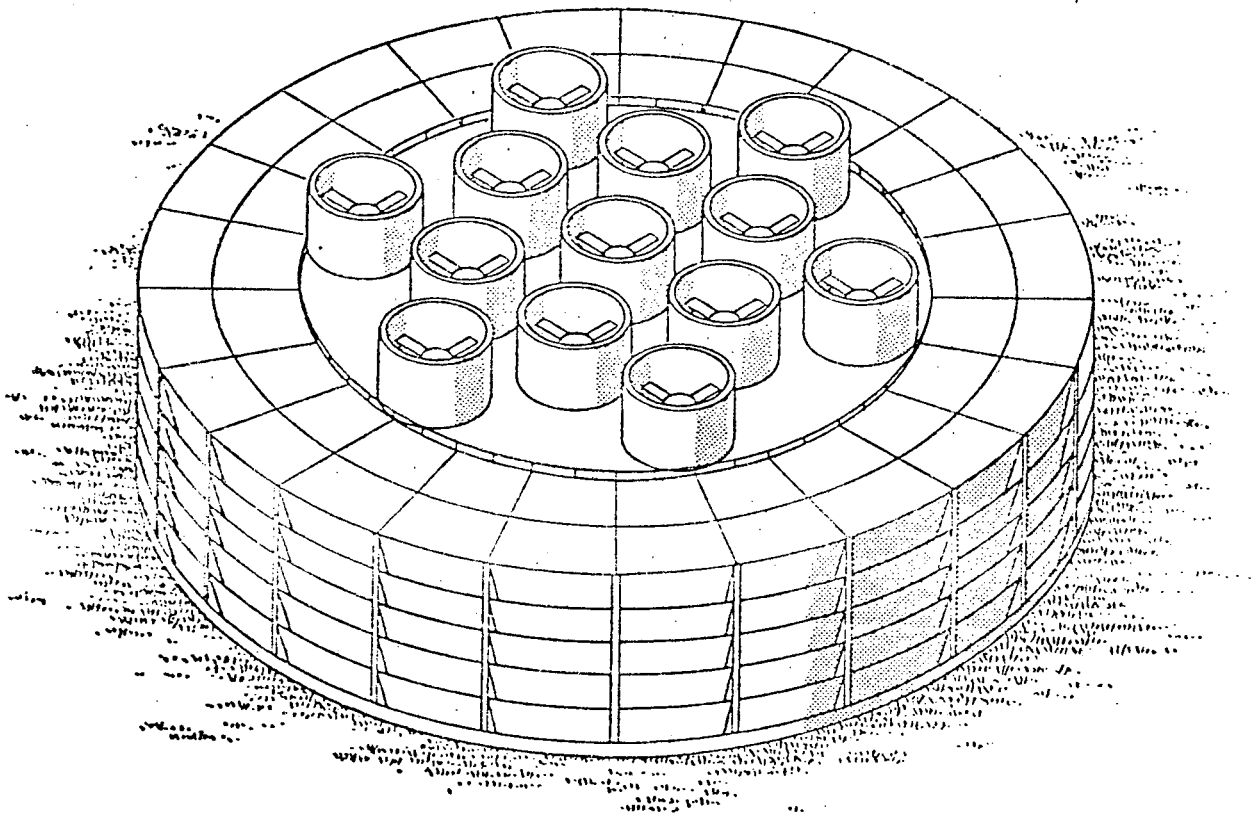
Conceptual sketch of circular mechanical-draft cooling tower. (The tower is about 270 ft in diameter and 74 ft high.)
